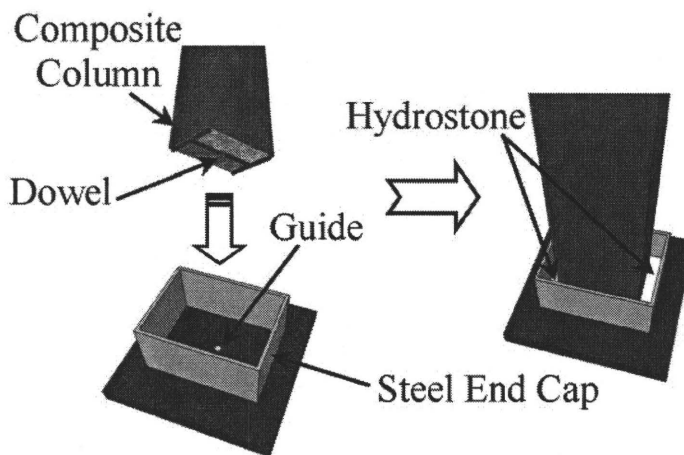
Method of capping the specimen ends to ensure uniform axial loading over the entire cross section
